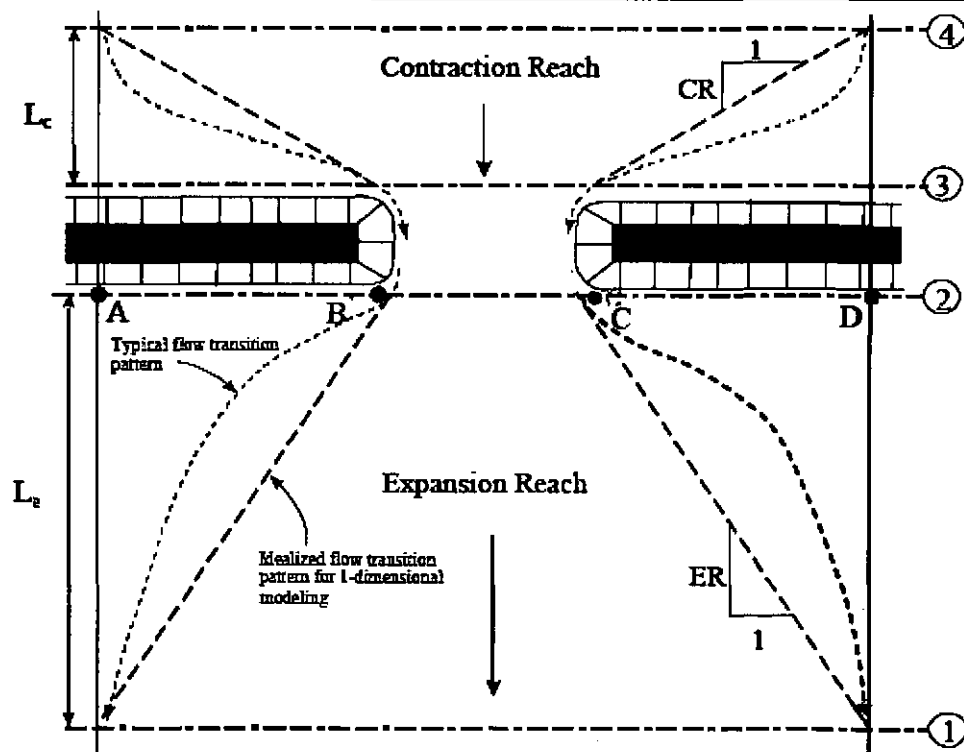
Cross Section Locations at a Bridge or Culvert
